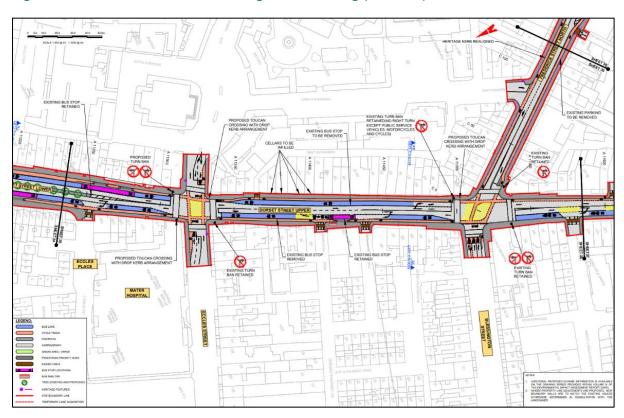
Extract from General Arrangement Drawing (Sheet 35)
